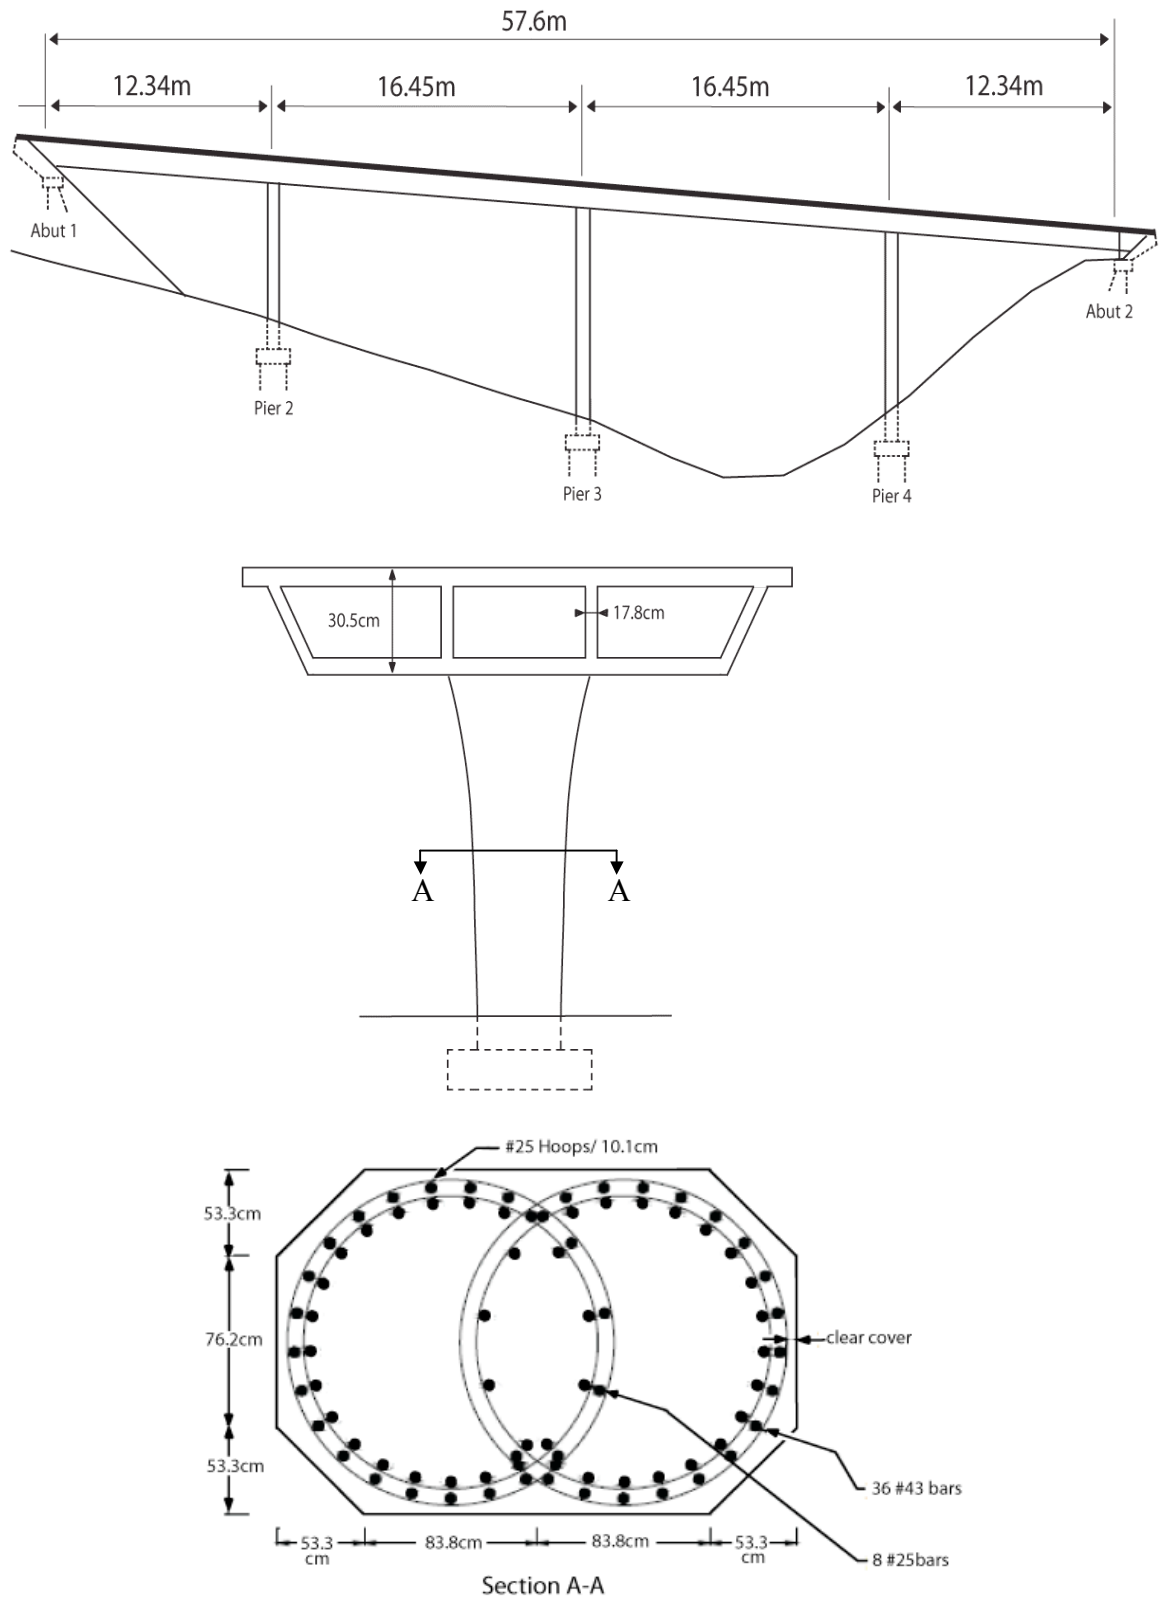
Elevation, deck and column dimensions, and column-section details of the multi span bridge.
